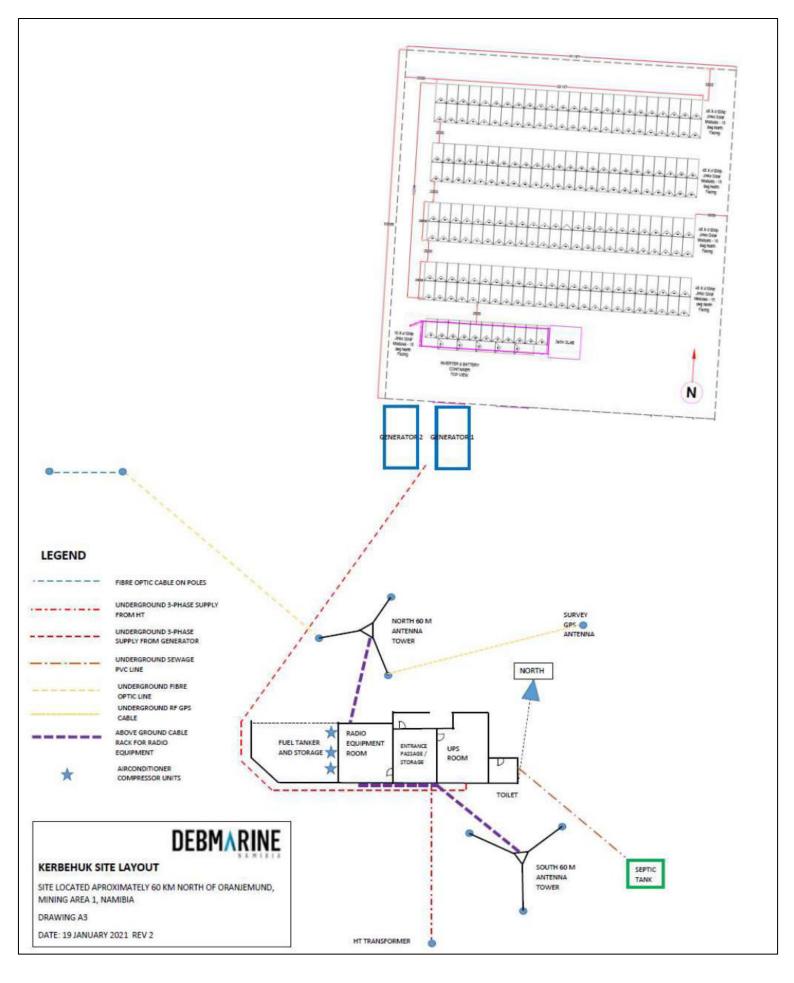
Site layout of the Kerbehuk line of sight communication station (Source: DBMN, 2023).
